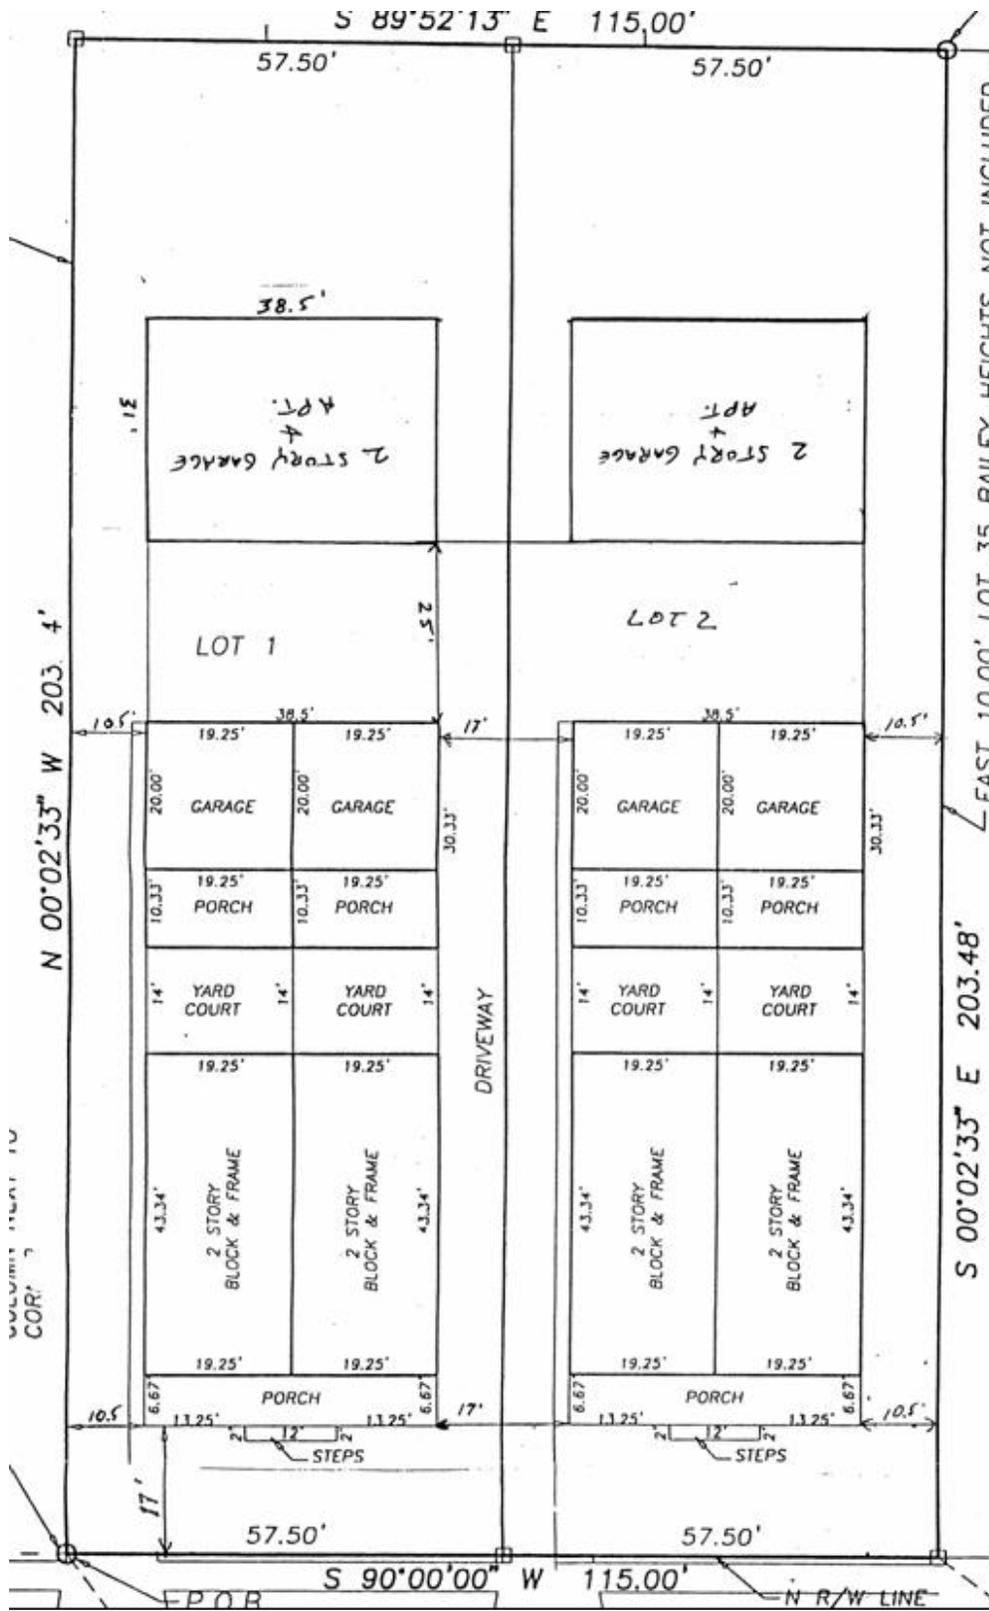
Proposed site plan for two duplexes with garage apartments at 223 E. Concord Street. Courtesy of Orlando HPB.
